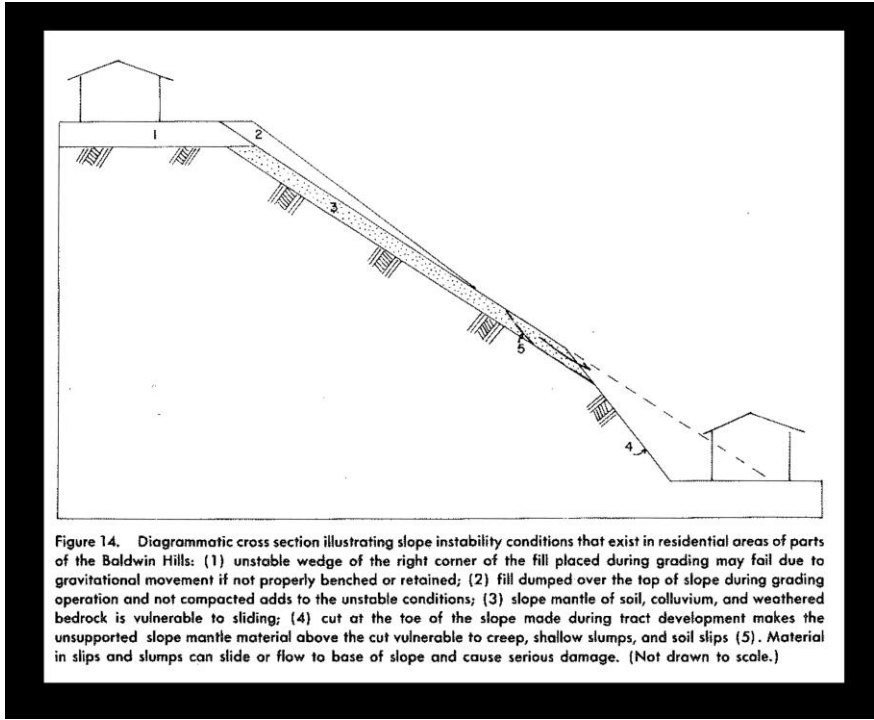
Diagrammatic cross section illustrating existing slope instability in Culver Crest. Image from Special Report 152.
